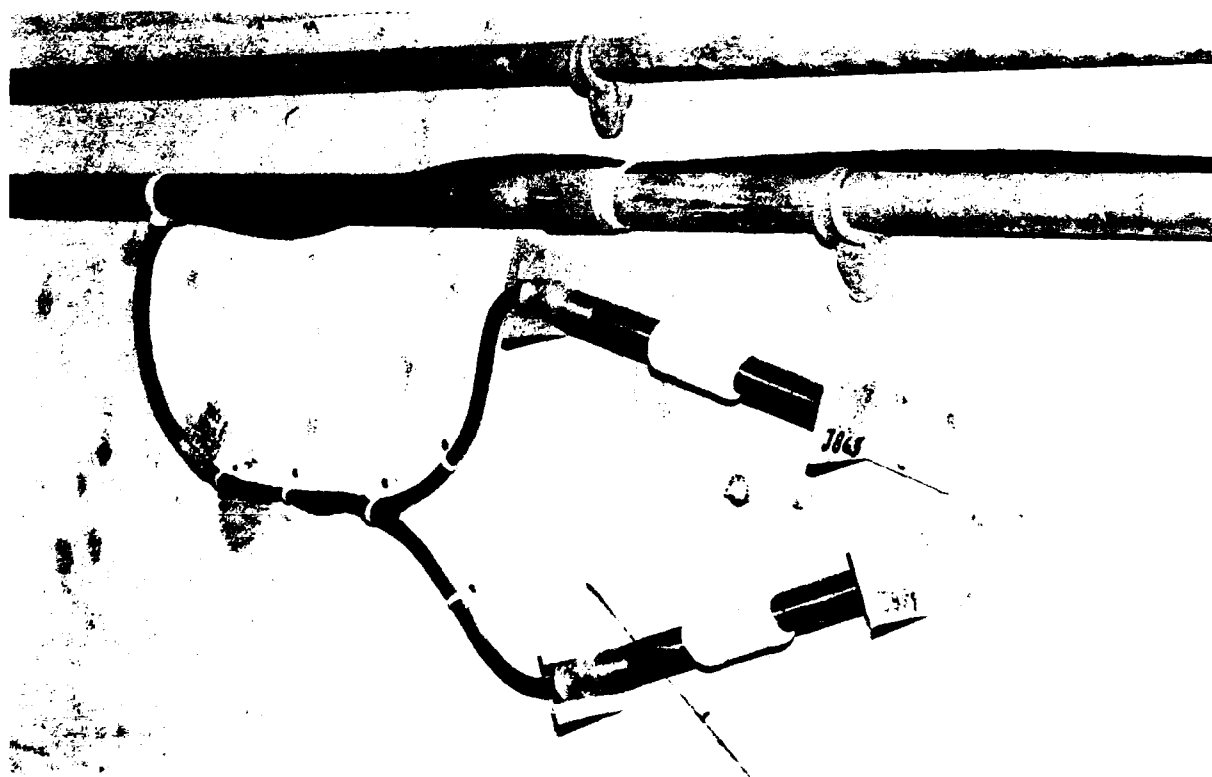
Photograph of cable to two Carlson joint meters showing the method of attaching cable to the wall
